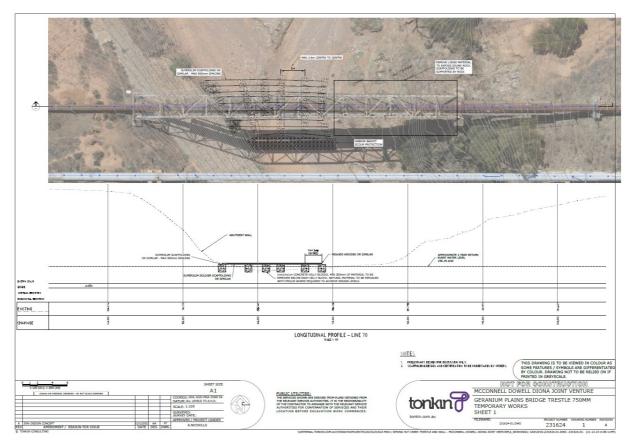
Preliminary layout of bridge upgrade components for the proposed action by SA Water and McConnell Dowell Diona Joint Venture.
